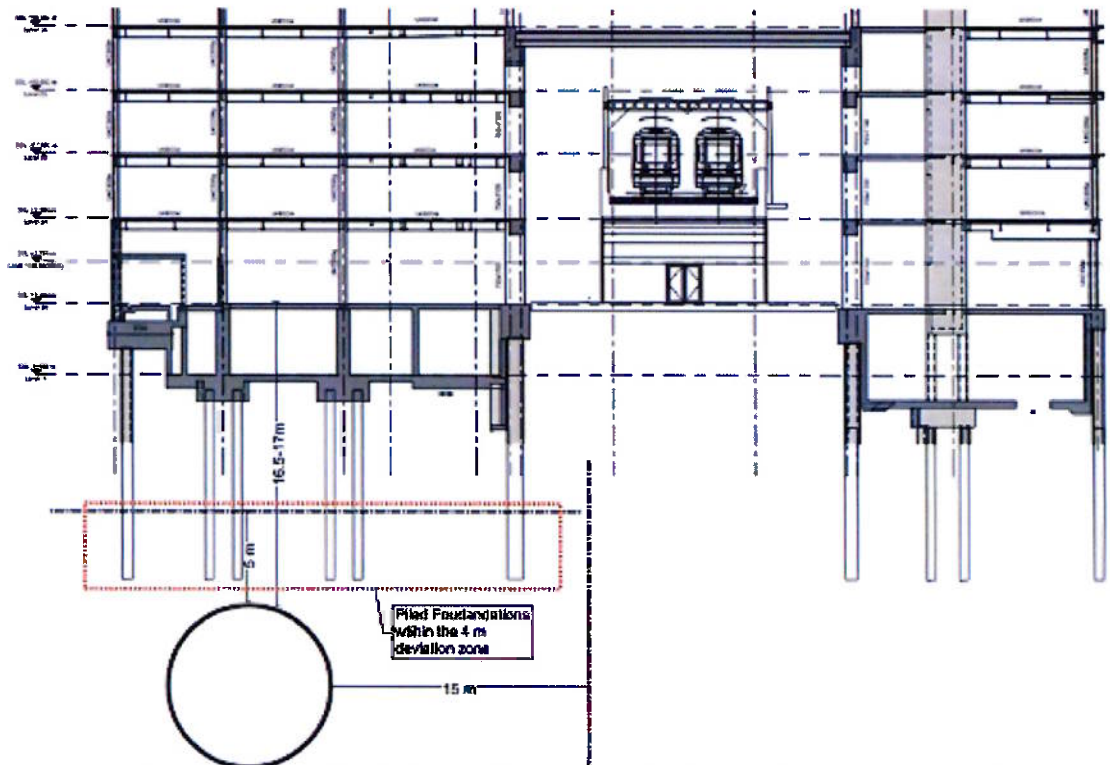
Section Illustration of the Metrolink tunnel as proposed in the draft Railway Order in the context of the permitted development. (Source: ARUP Consulting Engineers, 2024).
